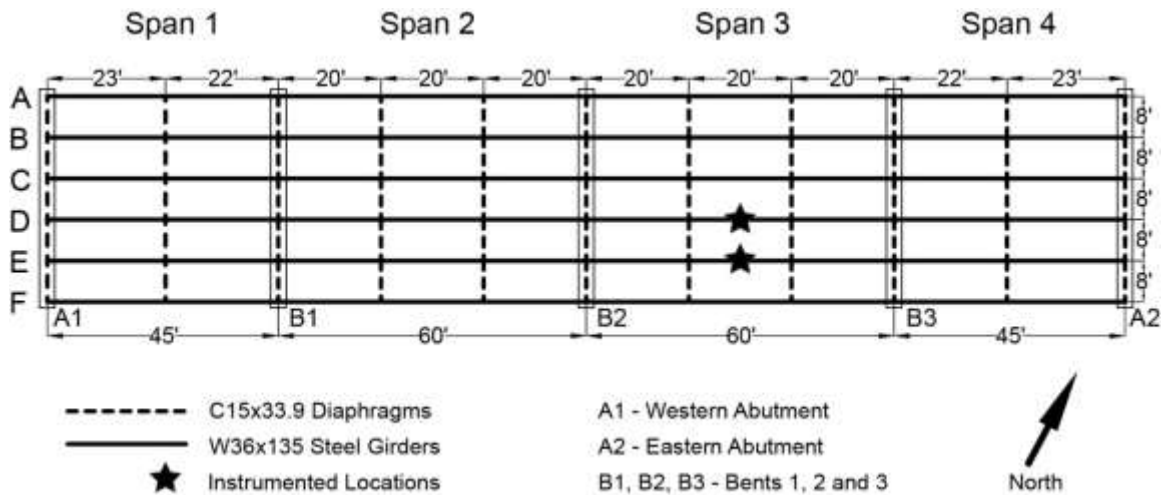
Instrumented Beam Cross-sections at Bagdad Rd.
